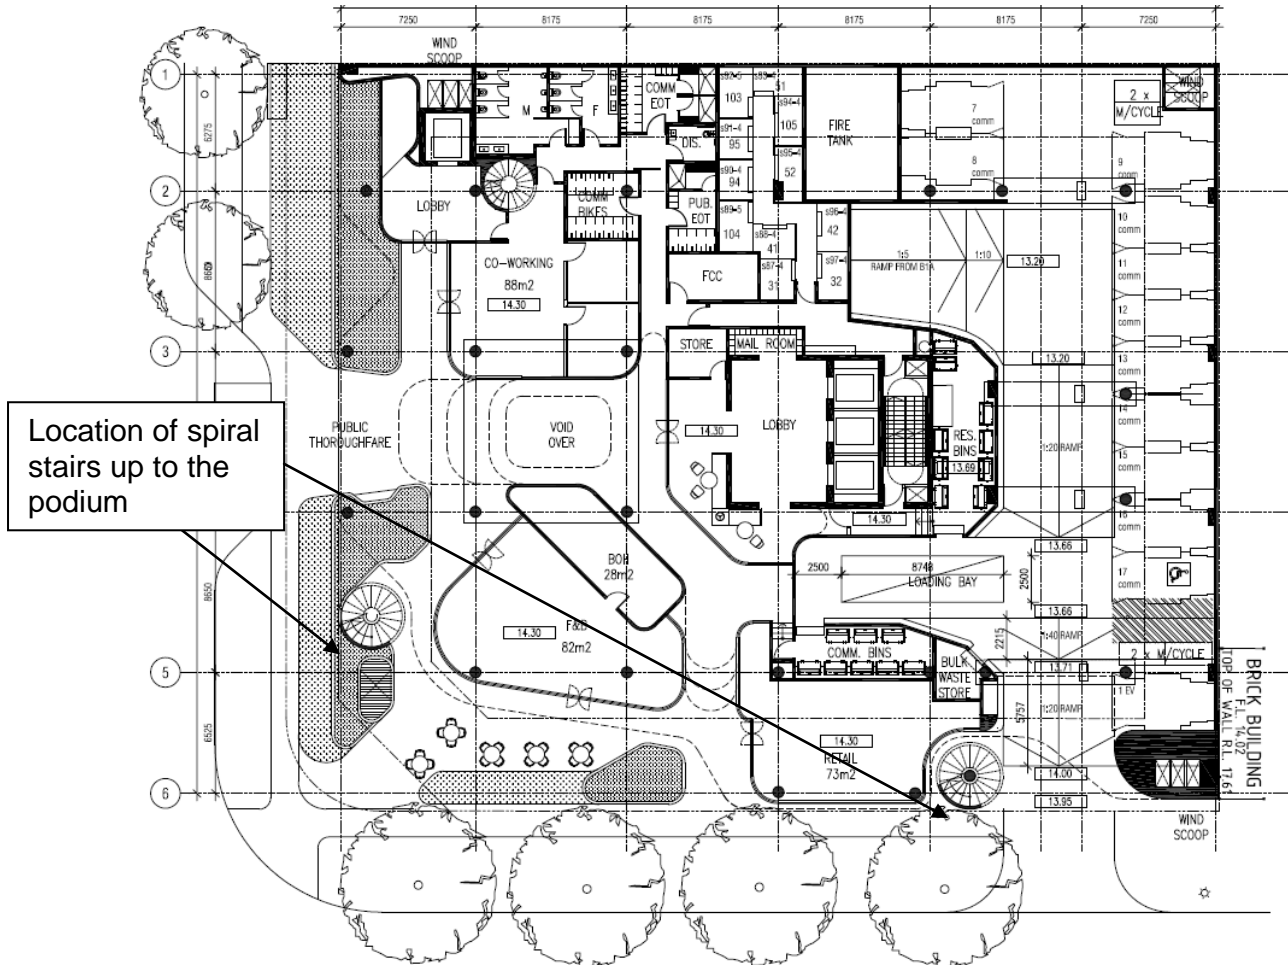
Current ground floor plan with two spiral staircases from both Forbes and Kishorn Roads up to the first level of the podium
